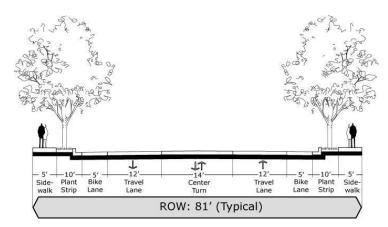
F Proposed cross section of 21st Ave from Hayford Rd to Flint Rd
